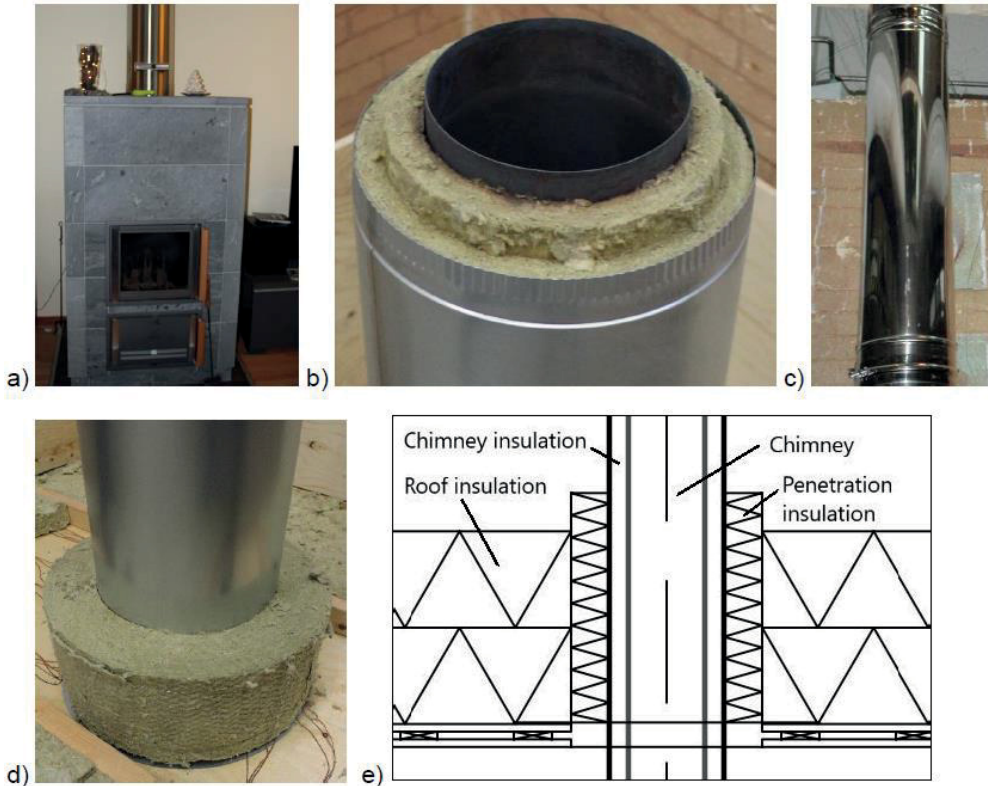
a) Fireplace b) Cross-section of a metal chimney c) Chimney module
